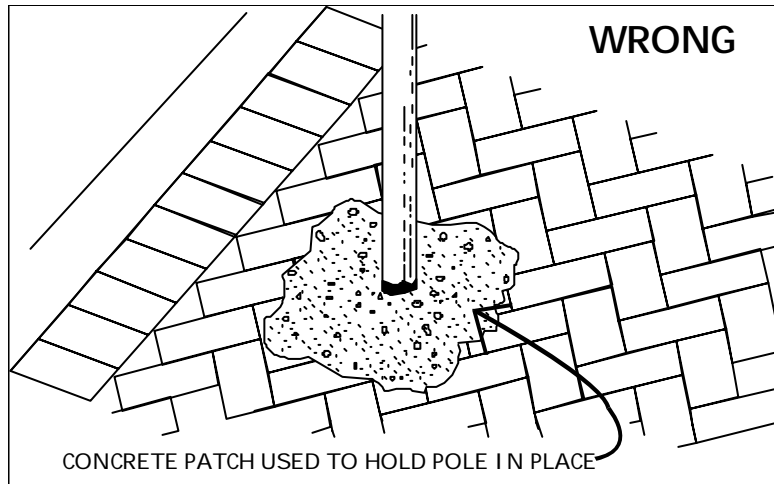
Incorrect Installation of Utility or Street Furniture
